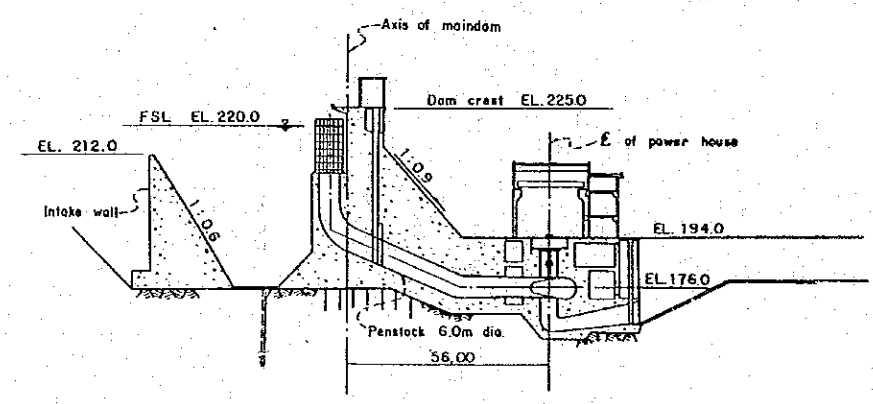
1 GENERAL PLAN OF DAM AND POWER PLANTS
